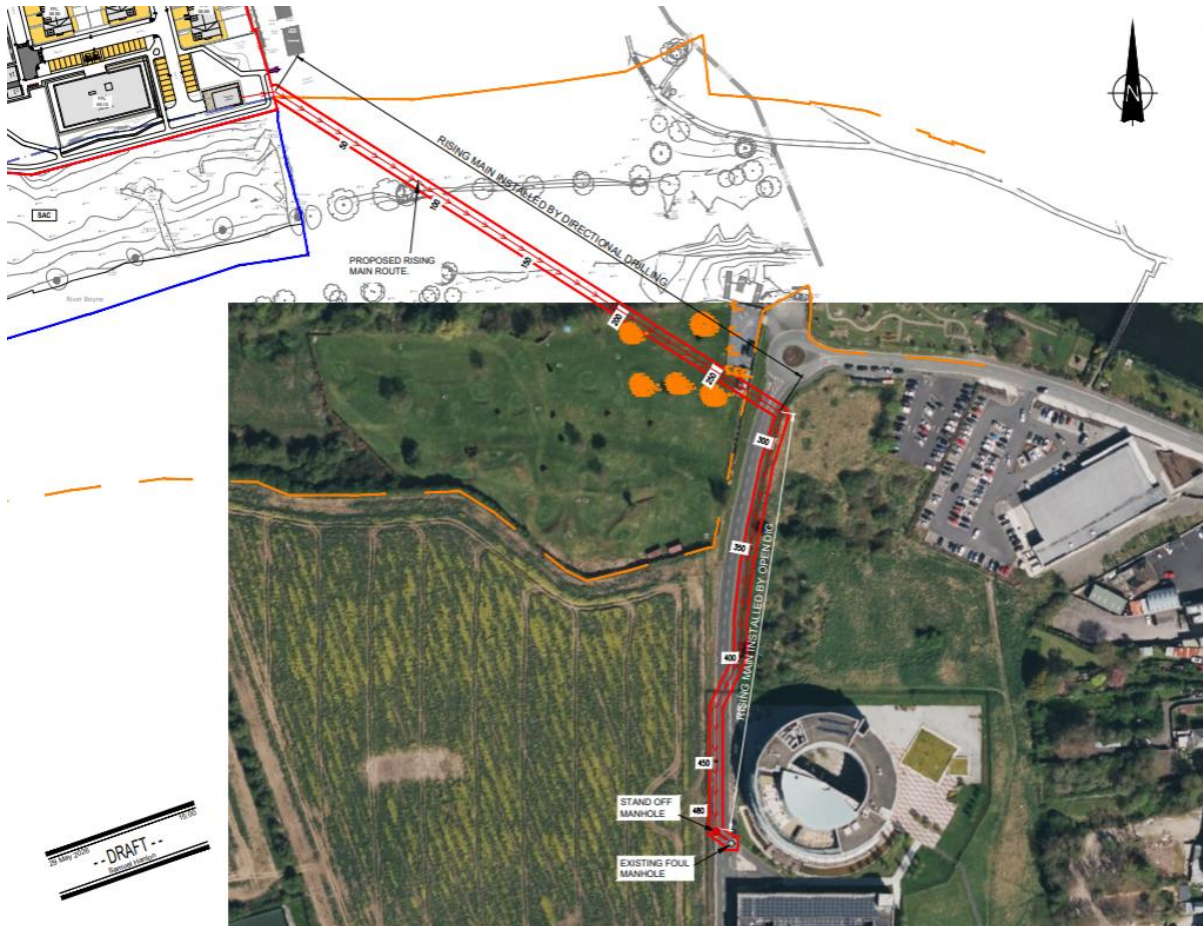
Proposed Rising Main - General Arrangement Plan-.
